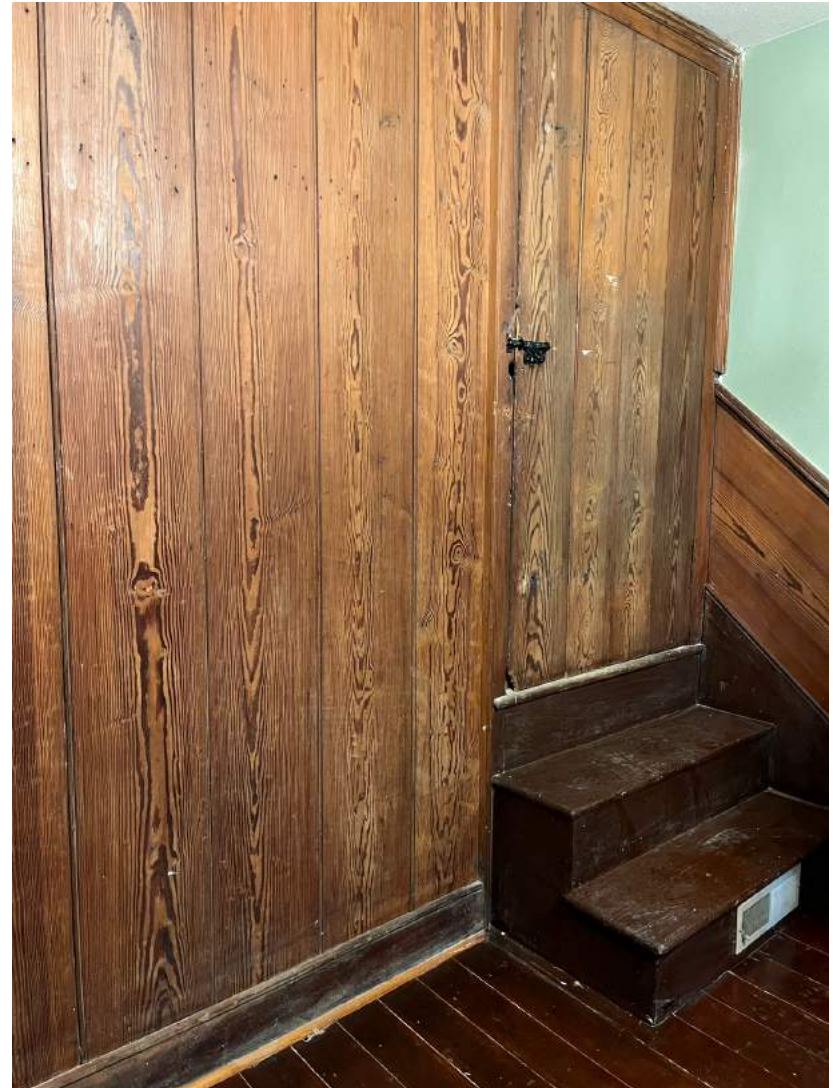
Second floor, southwest room, staircase to attic detail, 2023.
